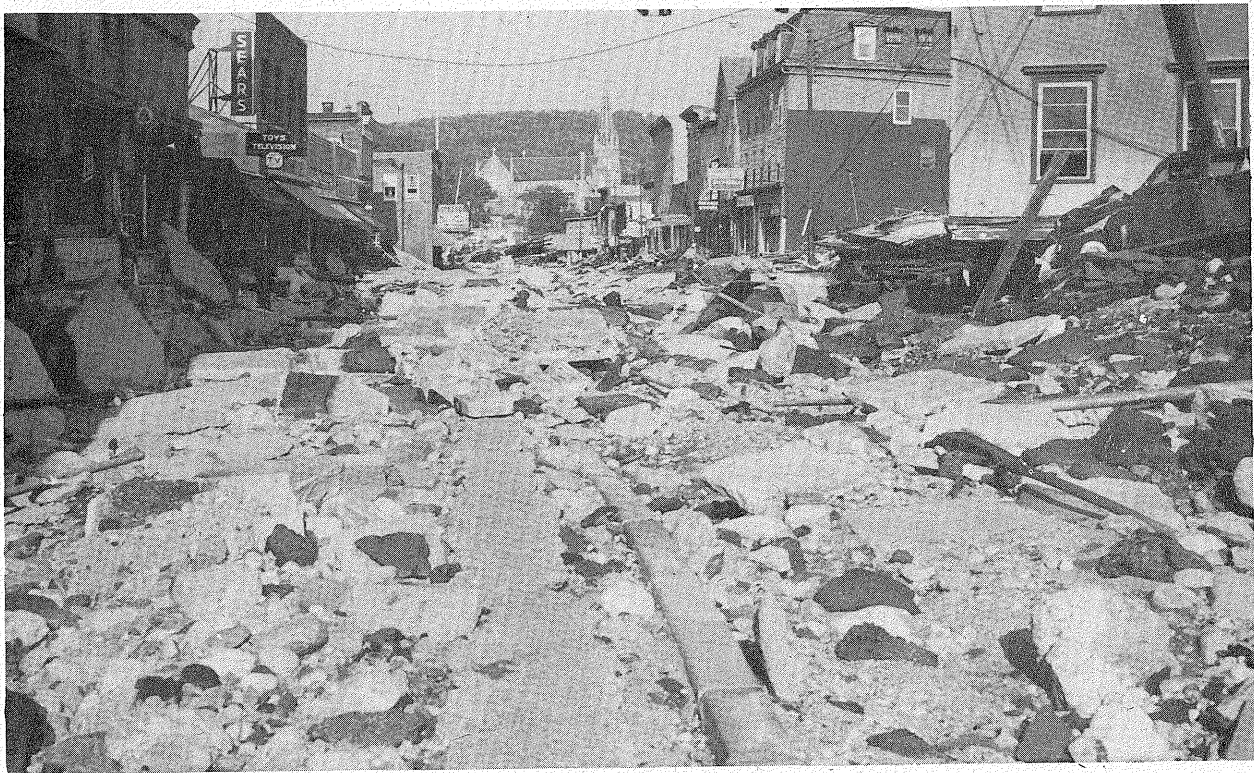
B.—Main Street, Winsted, Conn. Valley of destruction where Mad River ripped through valleys, homes, and pavements. (Photo courtesy of The Southern New England Telephone Co., New Haven, Conn.)
